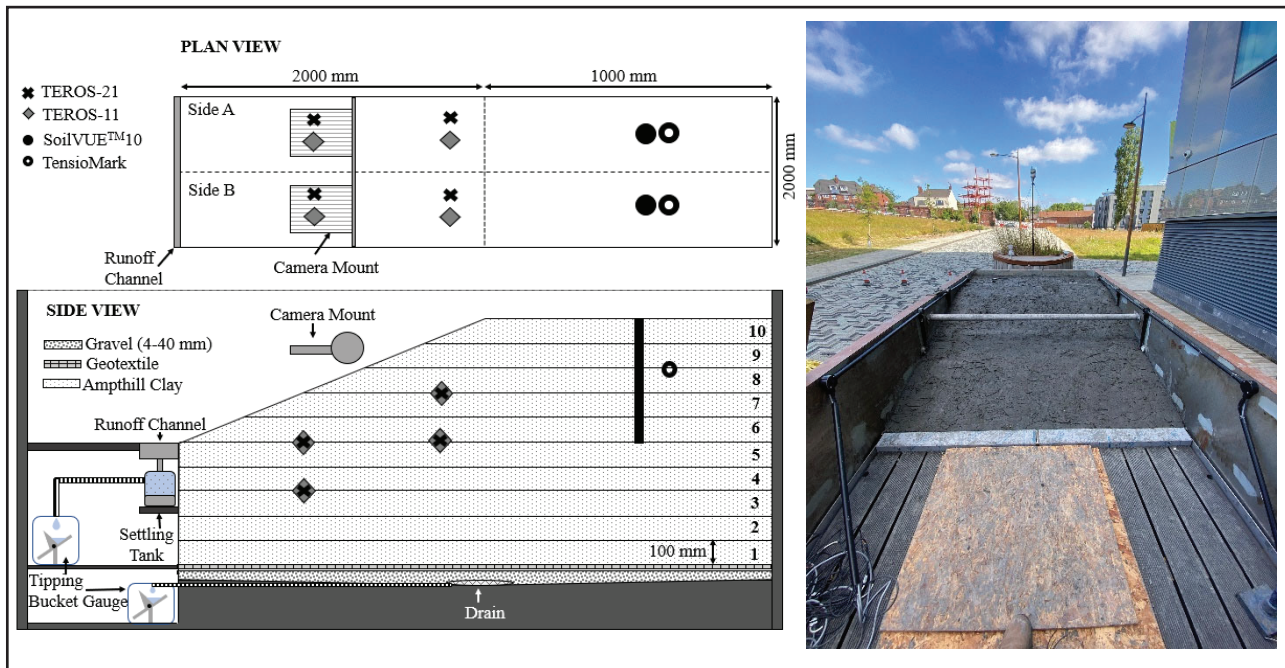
Plan and side view of the slope constructed within the outdoor lysimeter. Sensor installation and monitoring equipment are marked on the diagram (left). Photograph of lysimeter slope (right).
